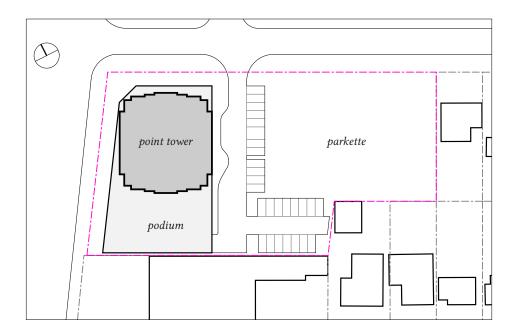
Condominium Project Site Plan—this figure illustrates the condominium project site plan, as developed prior to the global pandemic. The proposed design featured a parkette, east of the building; access to underground parking; ground-floor retail space, coupled with access to the residential areas; and, 24 surface parking spaces. (source: figure by author; adapted from a project by Kirkor Architects and Planners, n.d.)
